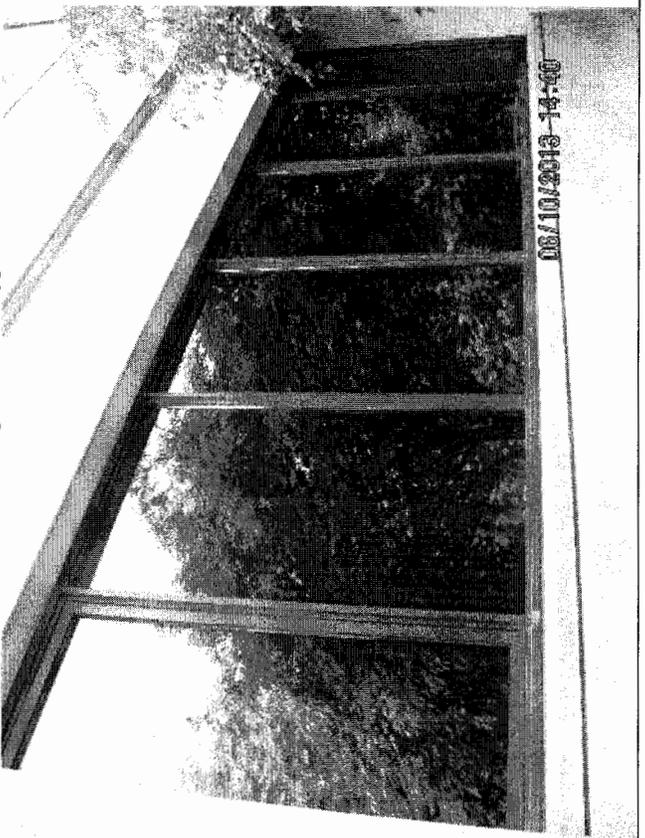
Third District Courthouse-Rolling Meadows-Typical 1st floor windows
